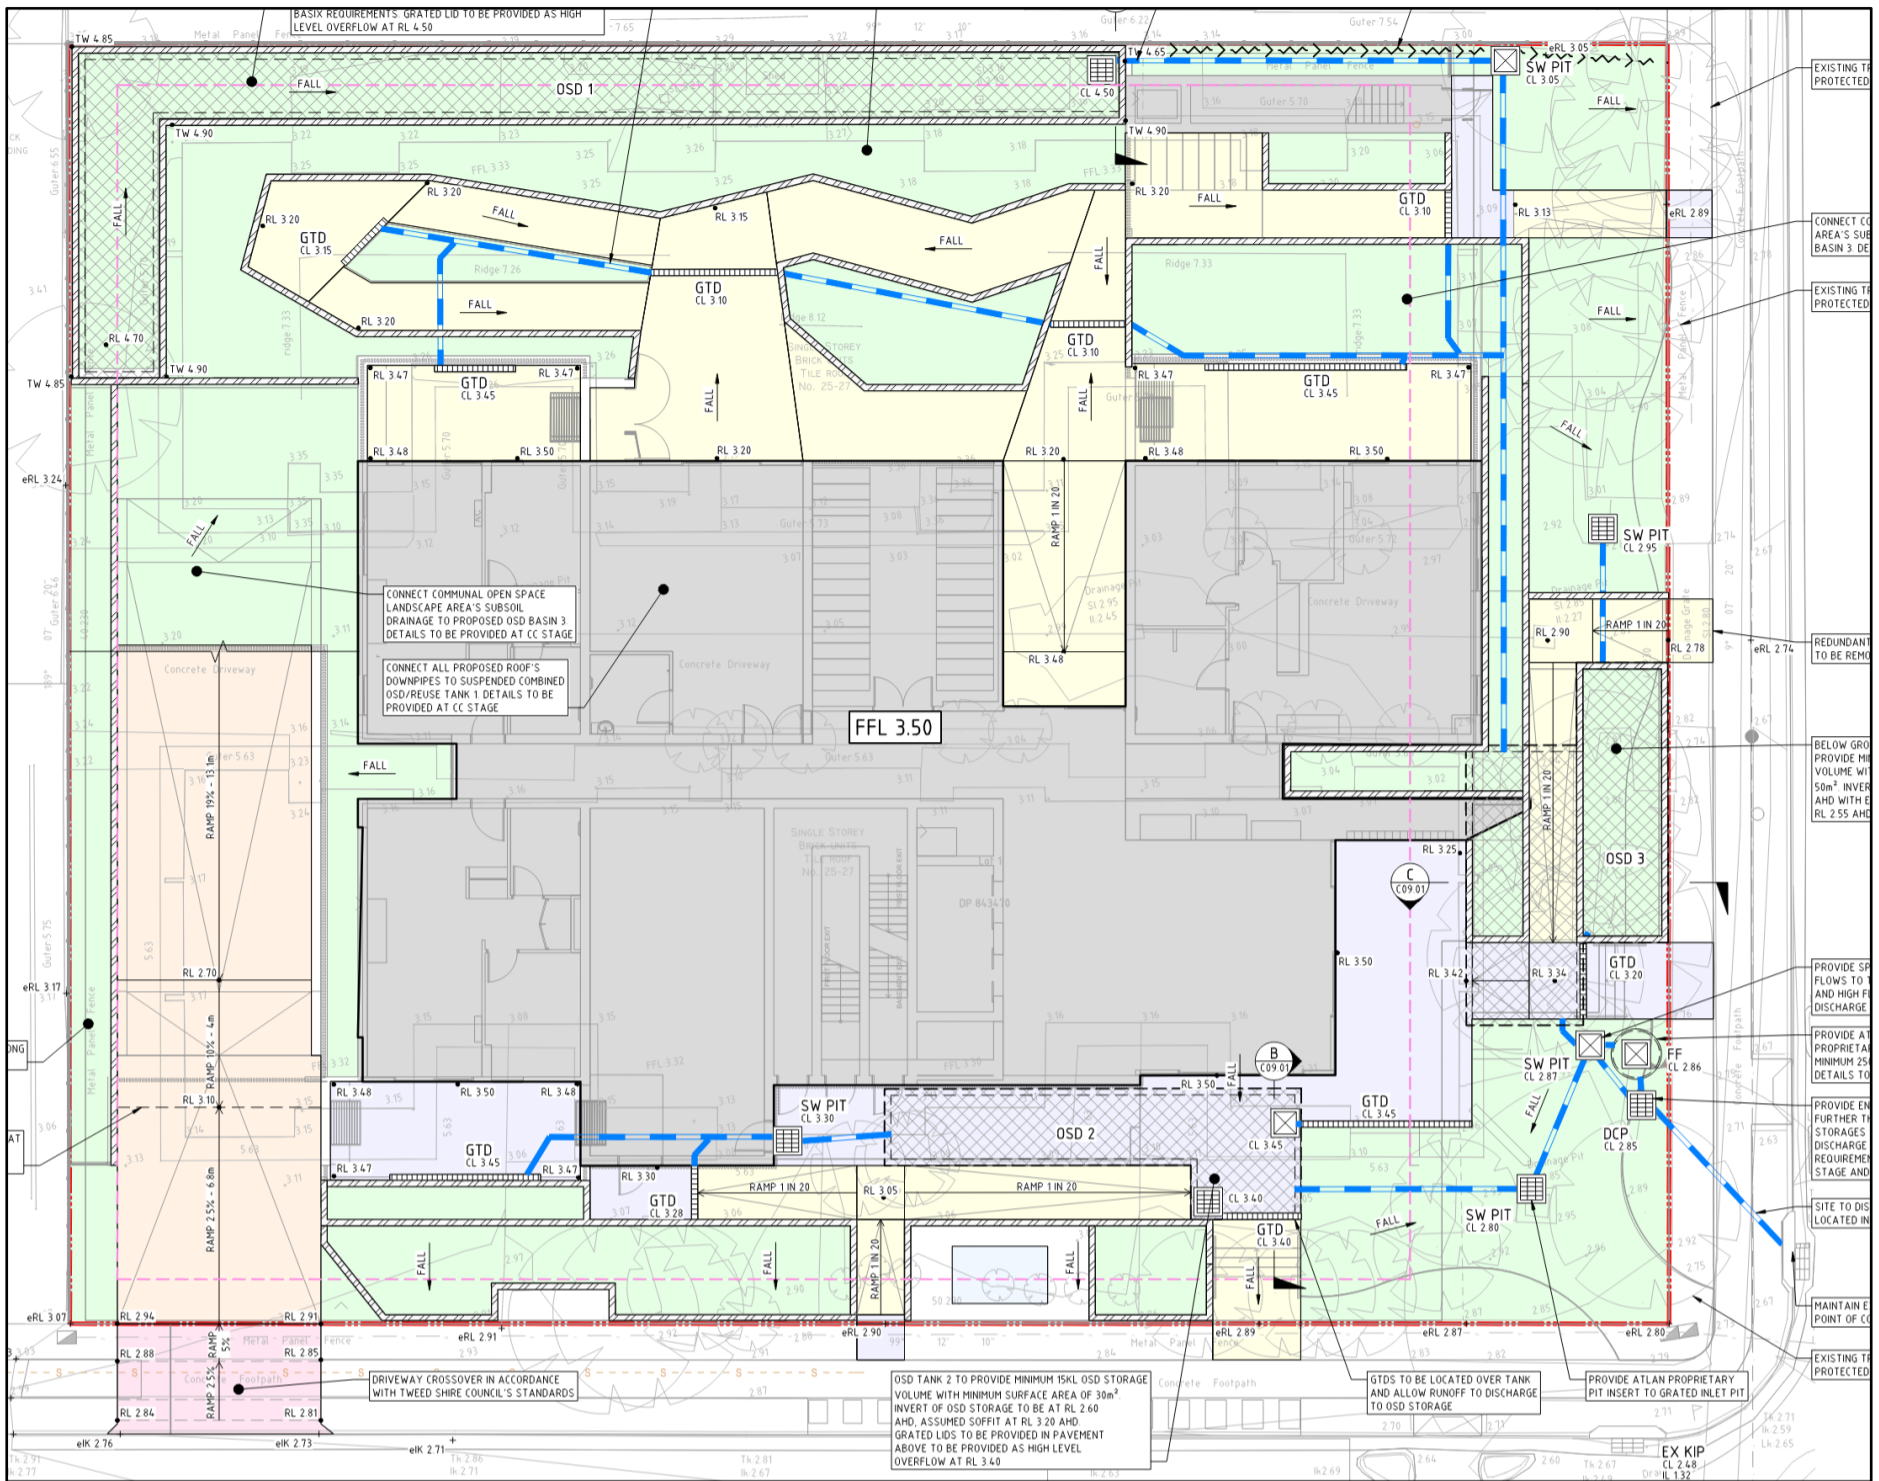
Site Plan and Building extents (DA-C04.01 REV D - 29/05/2025)
